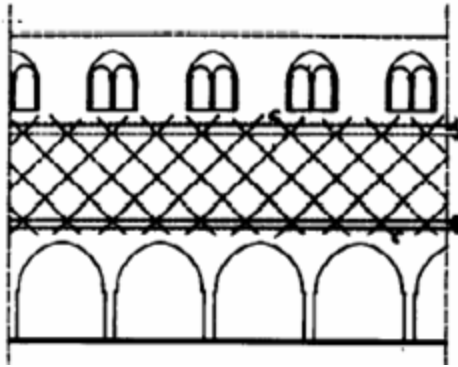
The sketch showing reinforcement of a masonry structure (Penelis, 1996)
